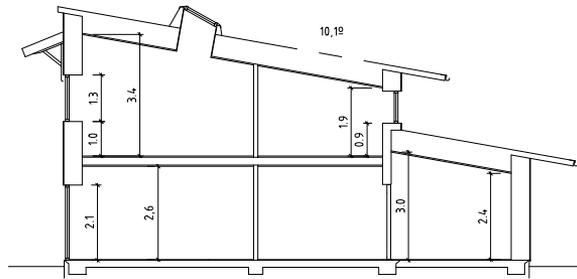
Section of the final design of the building (Vårgårdahus).
